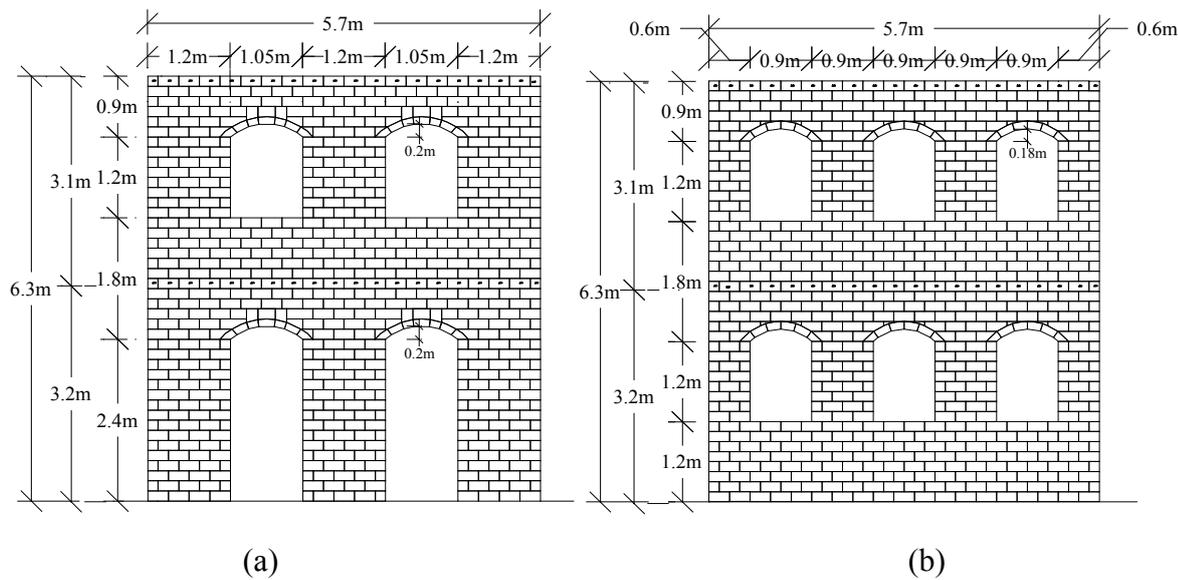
Geometry of Approximate Block models; (a) wall 1, (b) wall 2.
